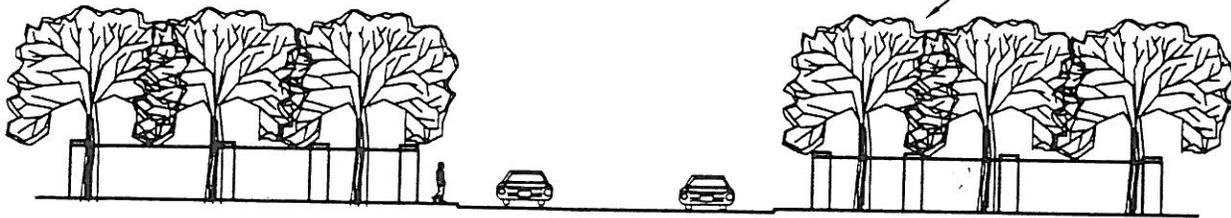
presents a plan view and elevation of the entry monument proposed for the intersection of Sierra Avenue/Jurupa Avenue. A low seat wall and entry signage wall will be provided; plant and masonry materials will be integrated with the two project entries at Jurupa Avenue. Figure 17A illustrates a site entry perspective.
